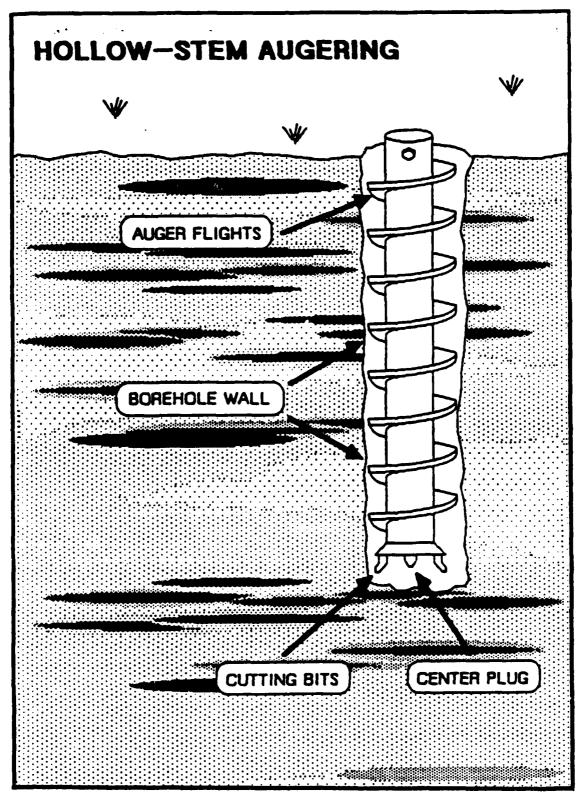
Cut-Away Sketch of Hollow-Stem Augering Method (25:65)
